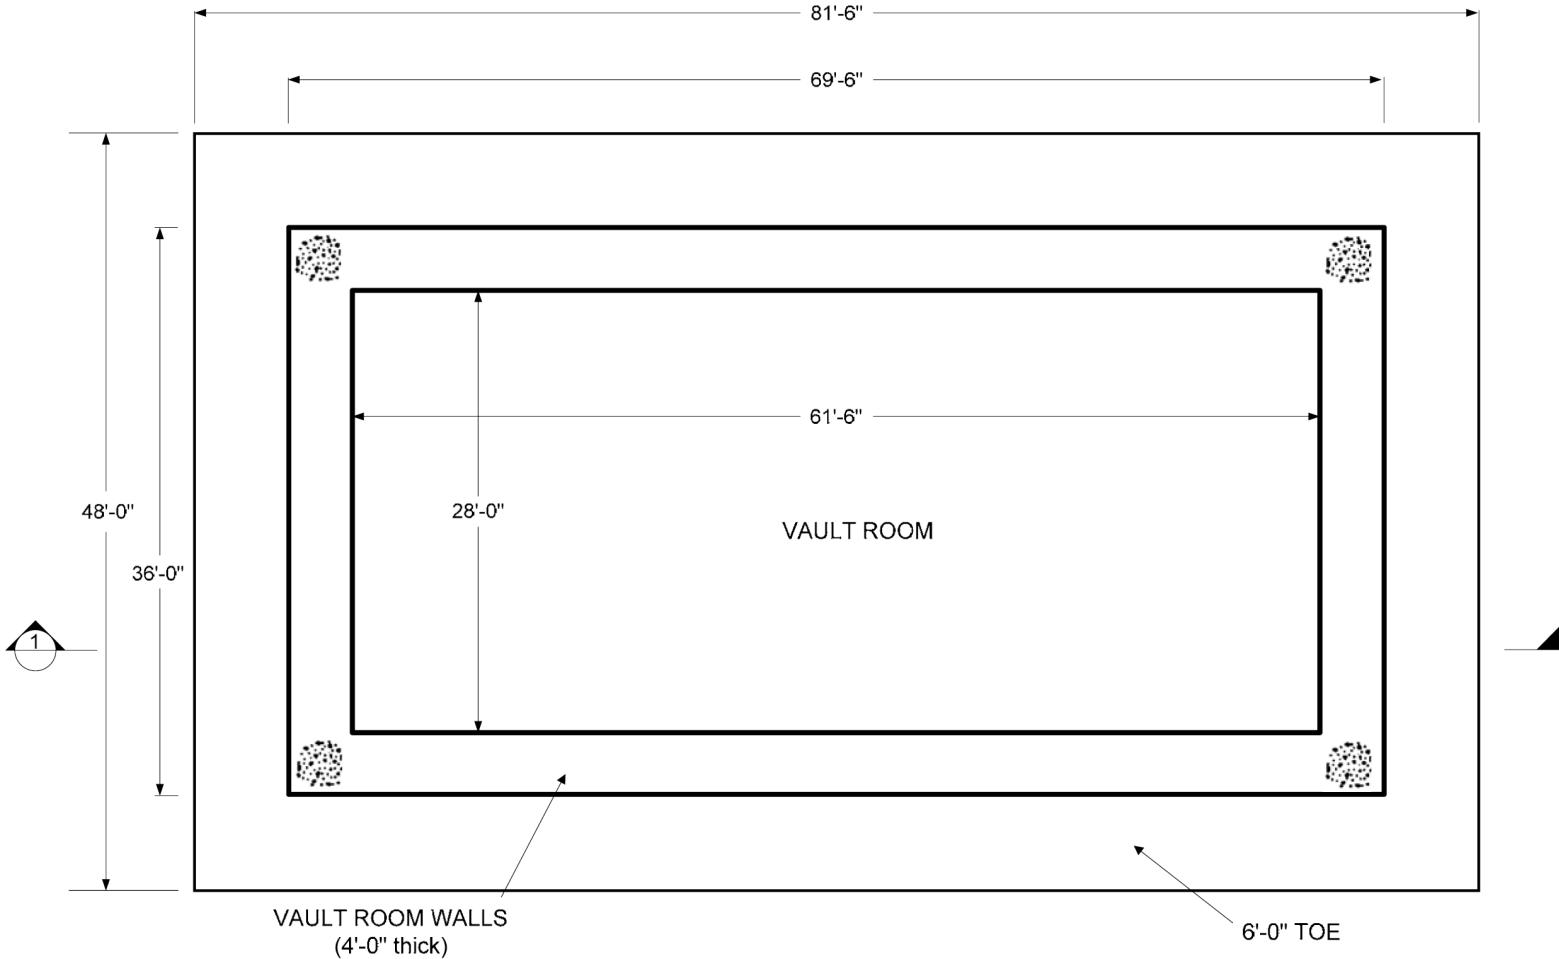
H.6-250 Plan View of DGFOSV at Elevation -3'-0"
